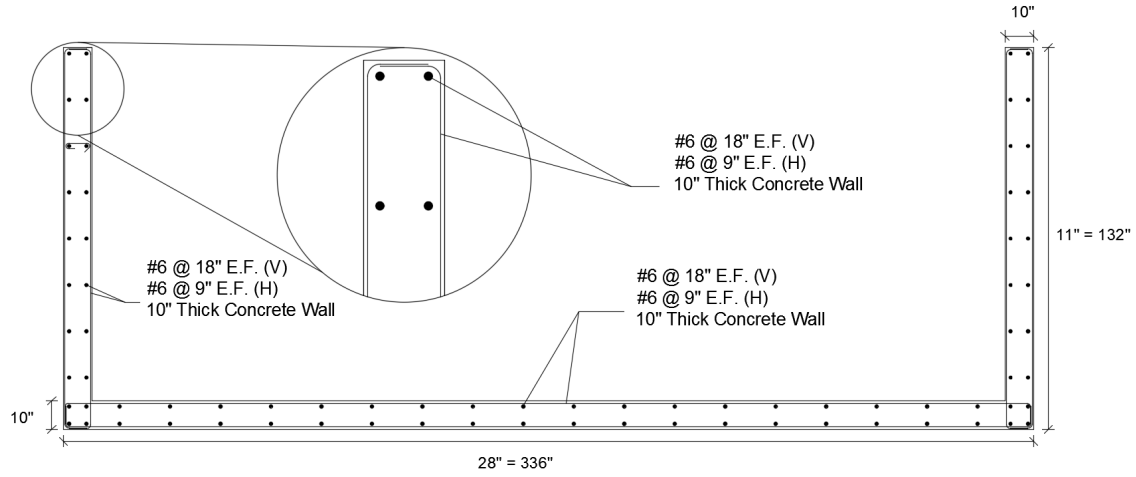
Original Elevator/ Mech. Room shear wall cross-section at the 3rd floor level
